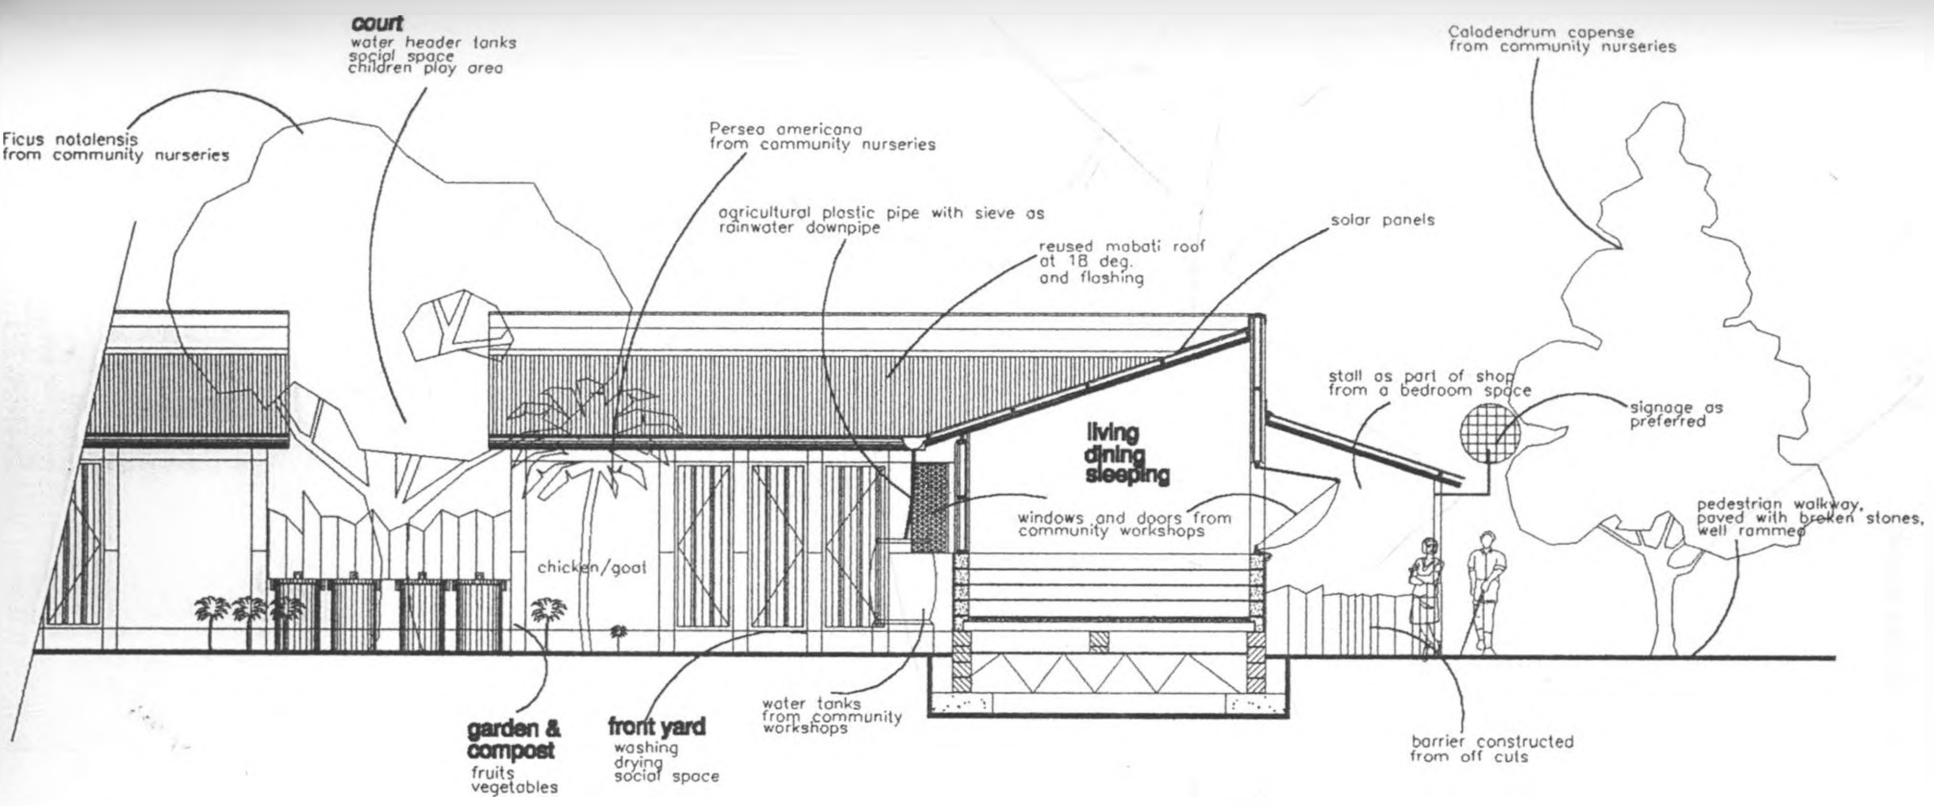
DWELLING UNIT TYPE 3 -TYPICAL SECTION-ELEVATION
